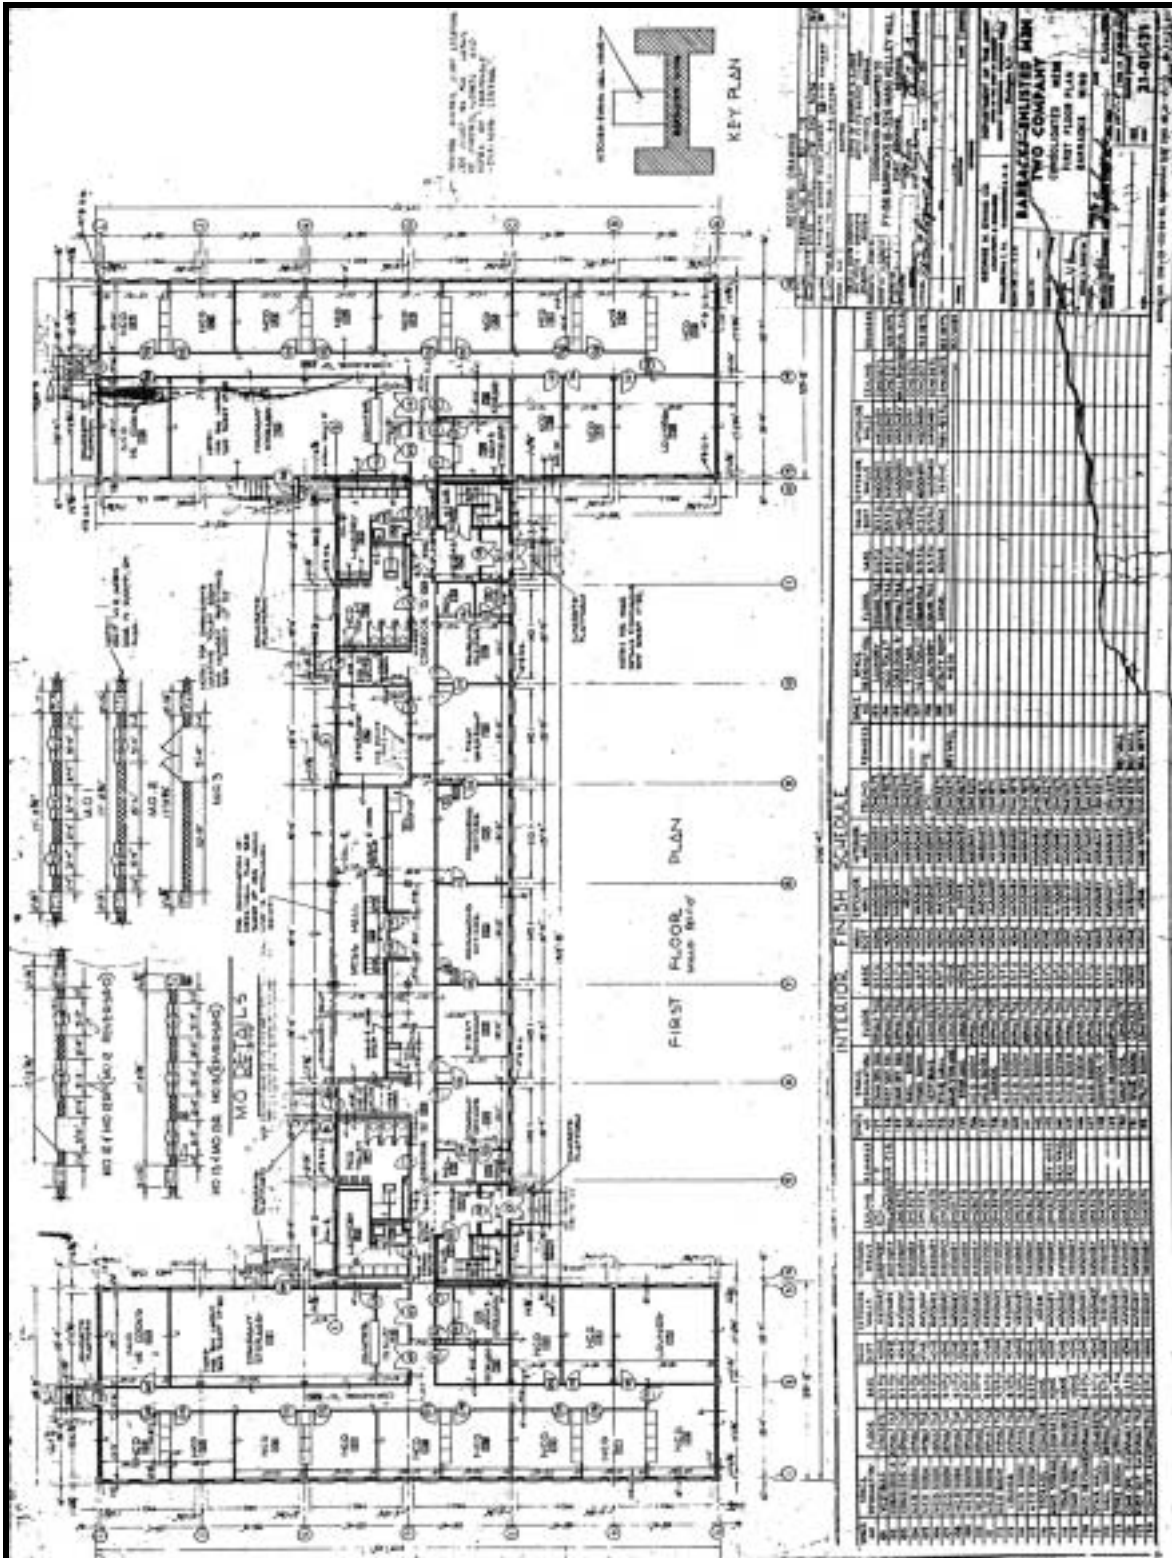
H-style, two-company barracks, barracks wing, first floor plan (1955, revised 1957) (Engineering, Ft. Benning).
